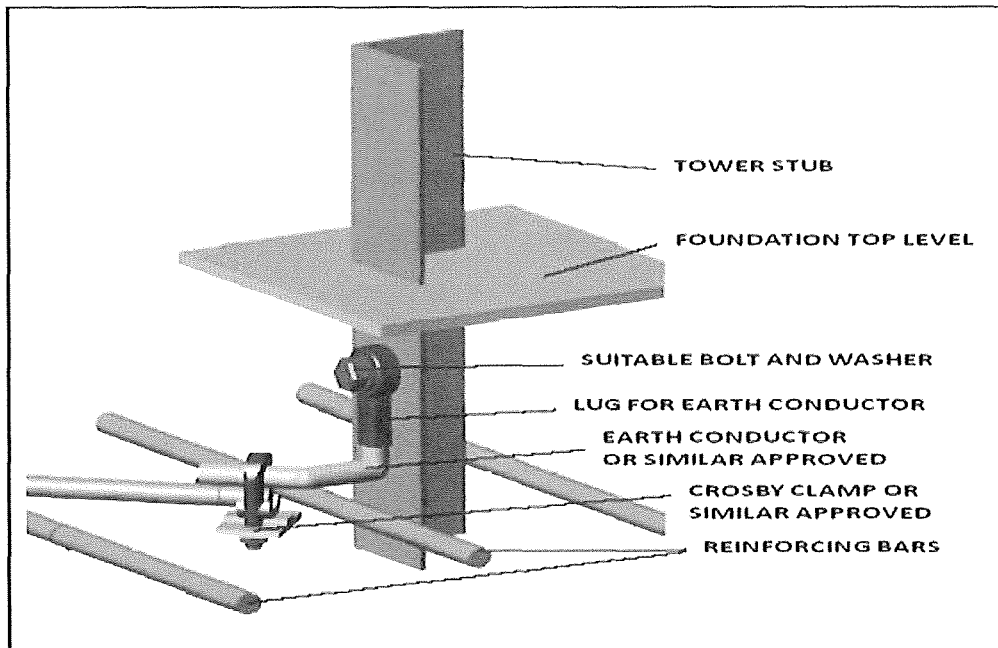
Connection between Self Supporting Tower Steel and Main Reinforcing Bar
